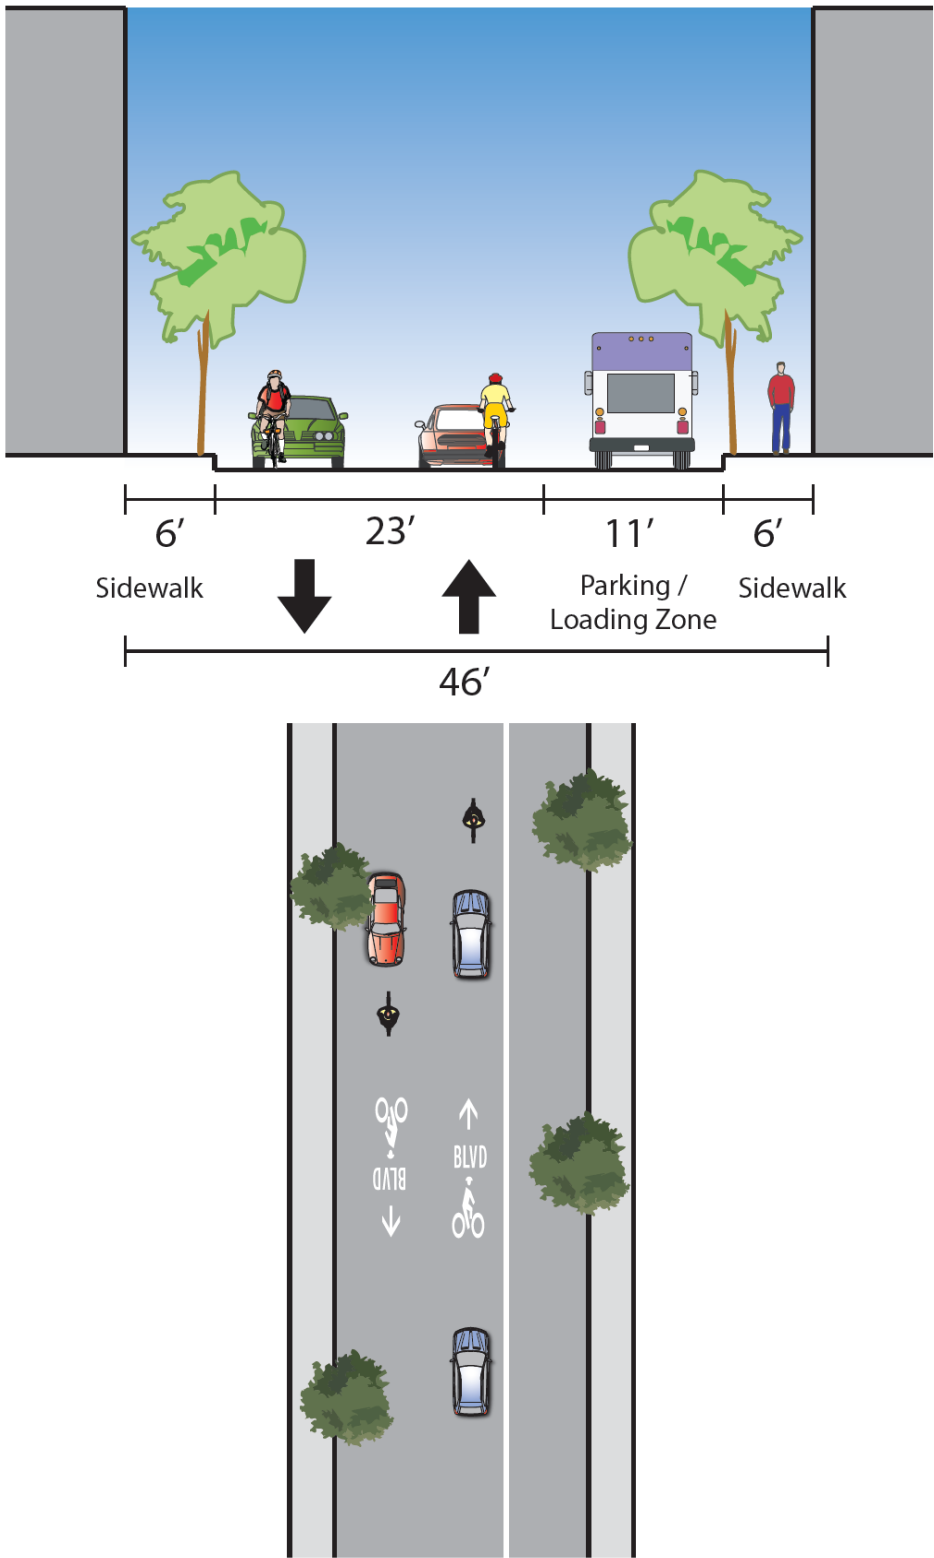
62nd Street to Stanford Avenue, Alternative 3, Shared Roadway with Parking/Loading Zone
